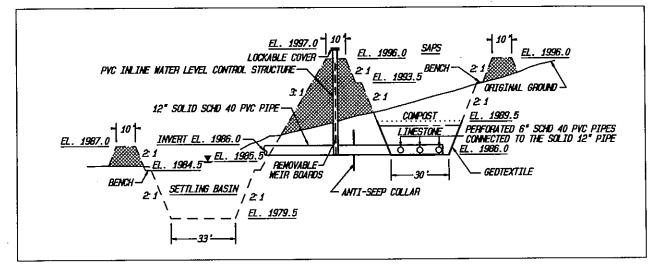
SAPS OUTLET USING WATER LEVEL CONTROL STRUCTURE AT OVEN RUN SITE E
